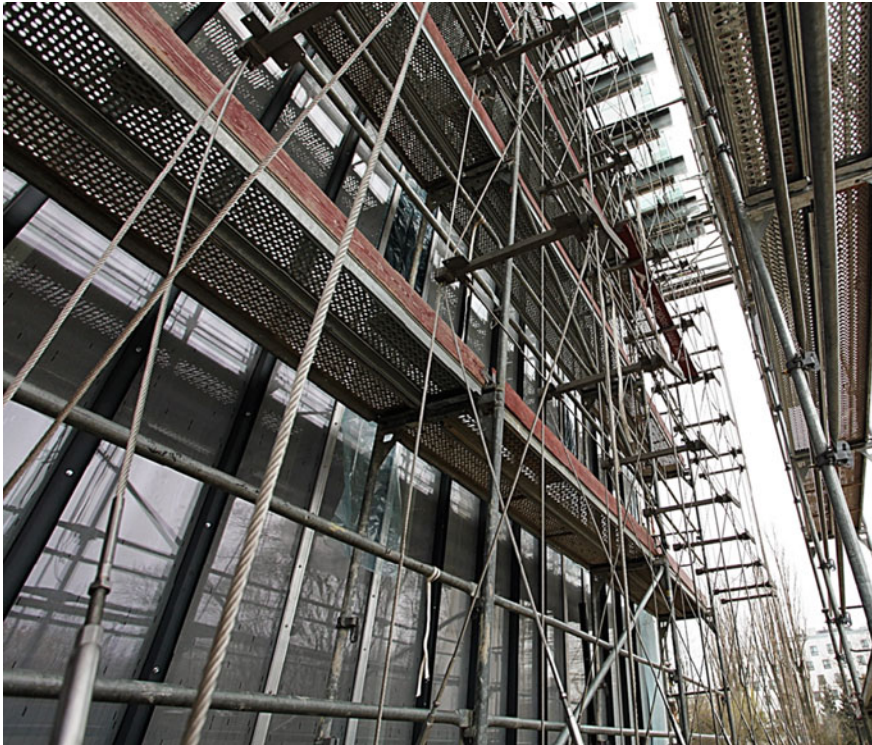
Stelmach & Partners, CSK, *Centrum Spotkania Kultur* (“Centre for Encountering Cultures”), Lublin. In-situ adjustment of steel segments protruding from the brackets to support spacers for mechanical jointing of the fixing devices. © Courtesy of Lilli Systems
